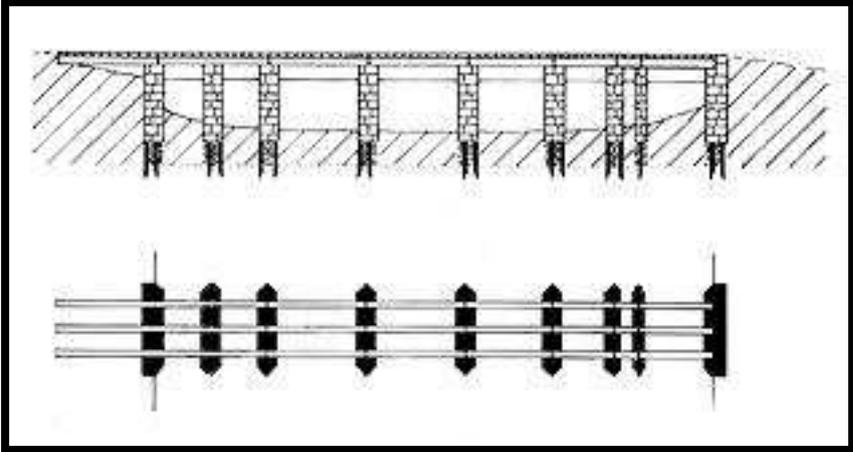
Likely layout of Roman bridge piers, Watling Street crossing at Rochester. That discovered in 1851 is at left. Rochester Bridge Trust.
